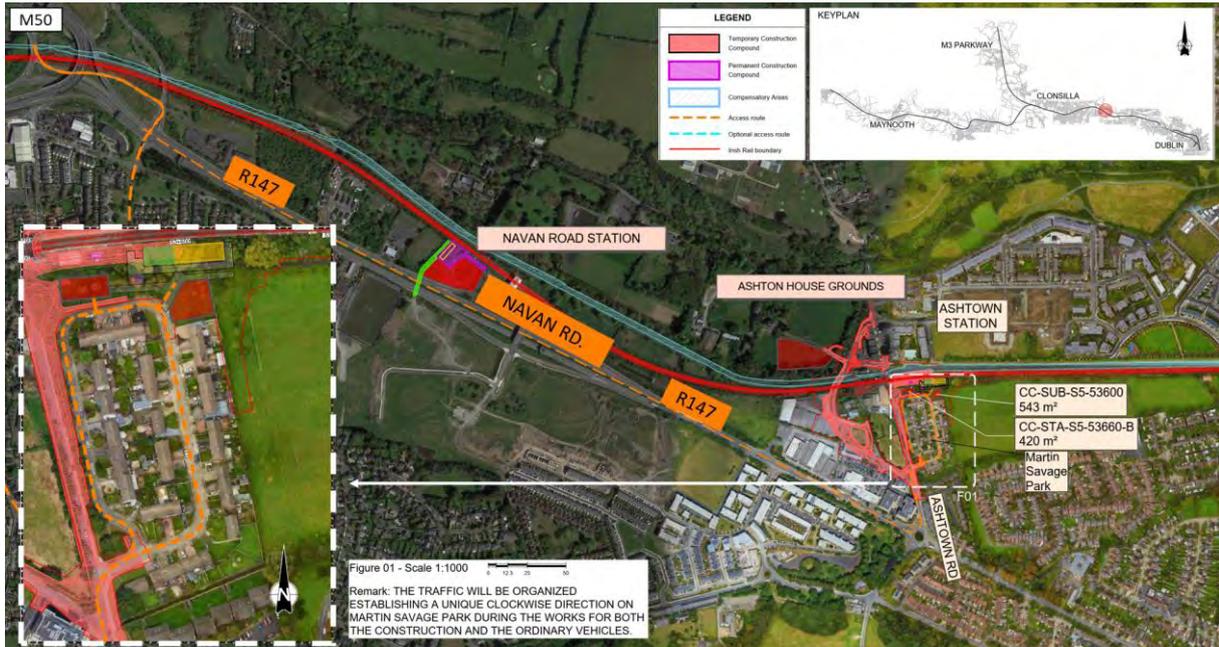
Ashtown substation and station construction compounds and haulage routes
